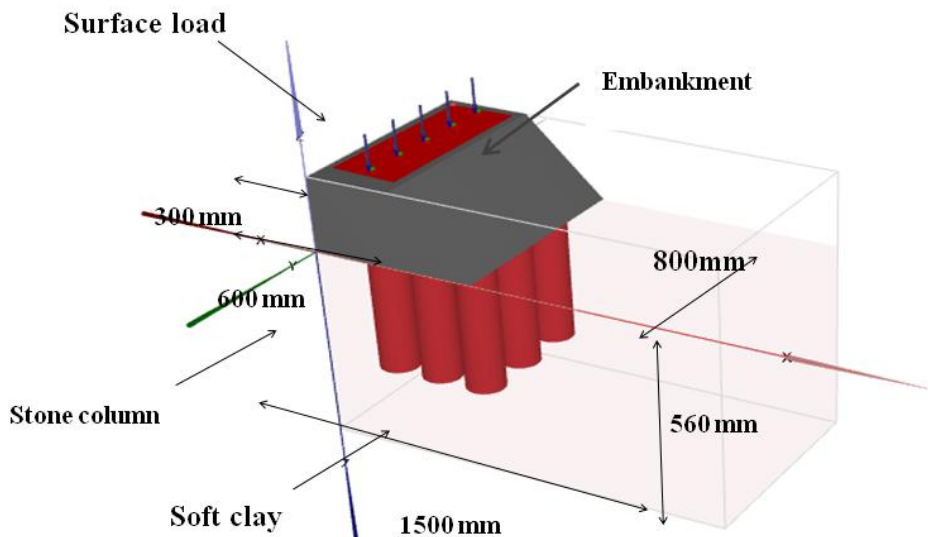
Three-Dimensional finite element modeling of piled embankment system ($L/d=8$)
